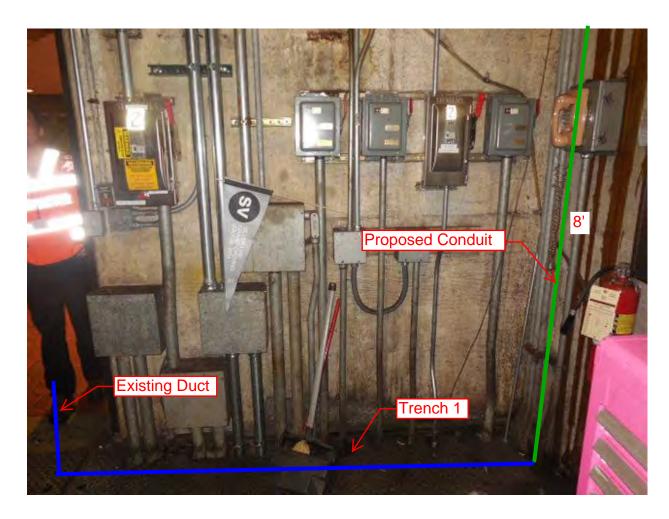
Proposed Overhead Conduit from Trench 1 in Room # 200
